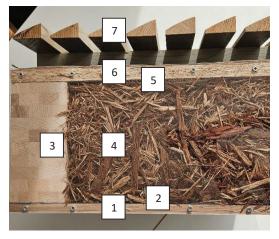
Cross-section of the load-bearing wall with exterior cladding: 1. Veneer plywood in interior side of the wall (2 cm), 2. Steam dam, 3. Ash wood laminated beam (9.6 x 20 cm), 4. Oak bark insulation (20 cm), 5. Vapour-permeable film, 6. OSB panel in outer layer (2 cm), 7. Exterior ventilated cladding
